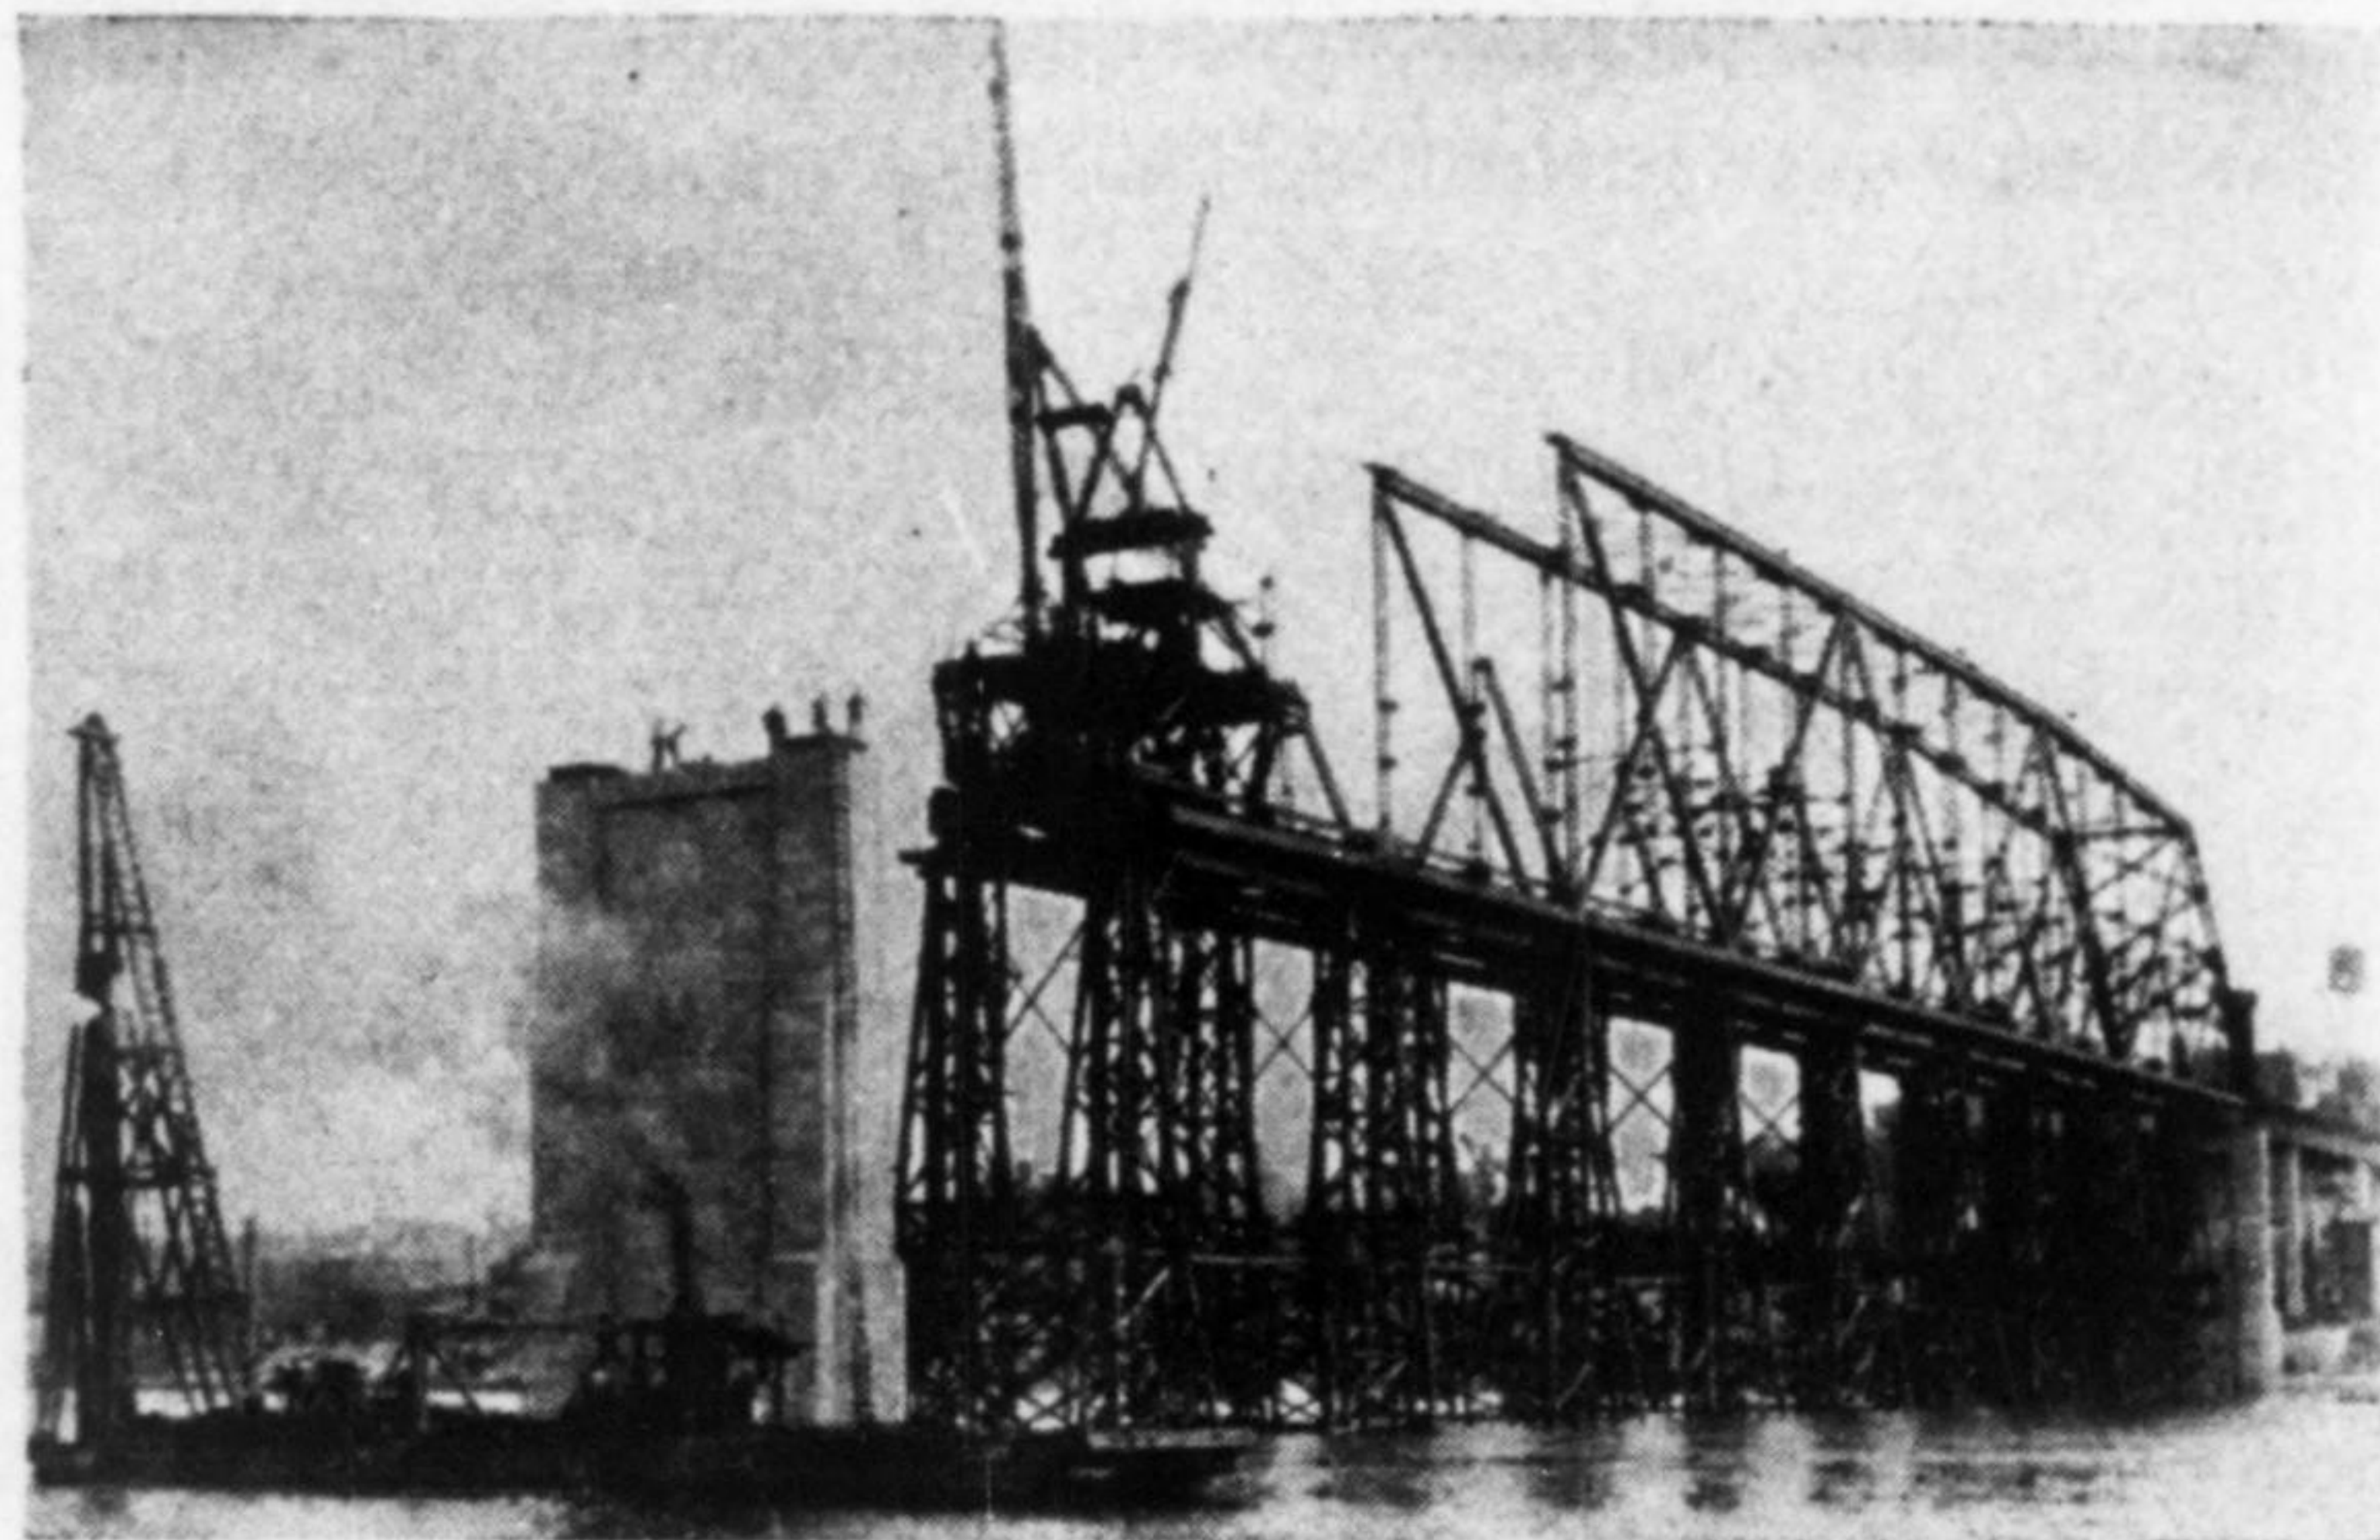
ERECTING FIRST MAIN SPAN, QUINCY BRIDGE
